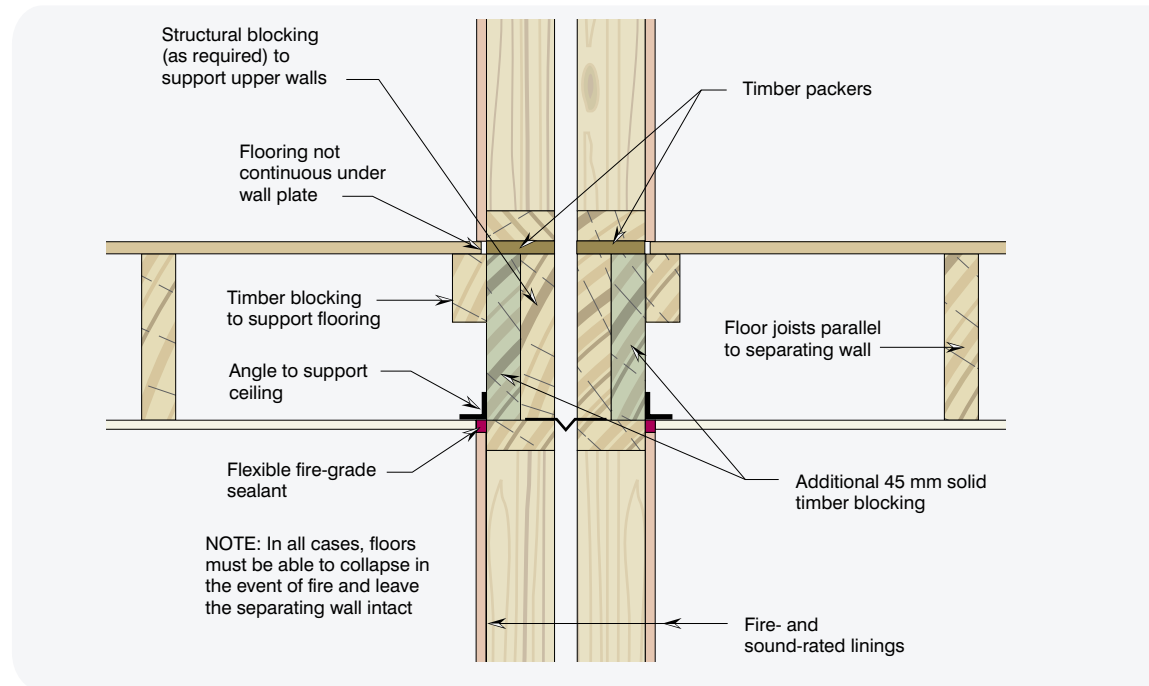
Joist parallel to the wall, wall stud not continuous through junction – FRL 60 minutes – elevation view.
